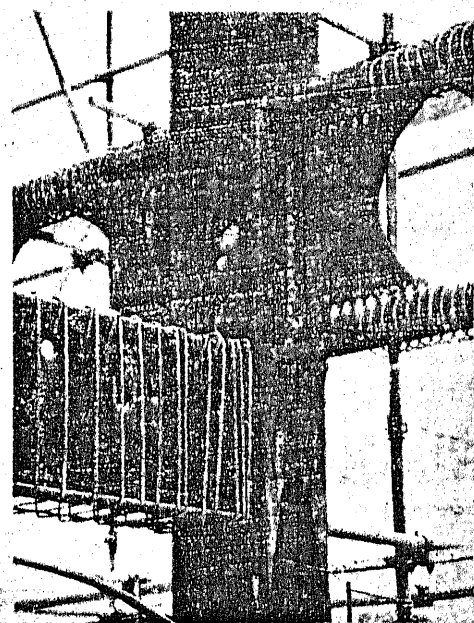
EXTERIOR BEAM TO COLUMN SPANDREL JOINT.
